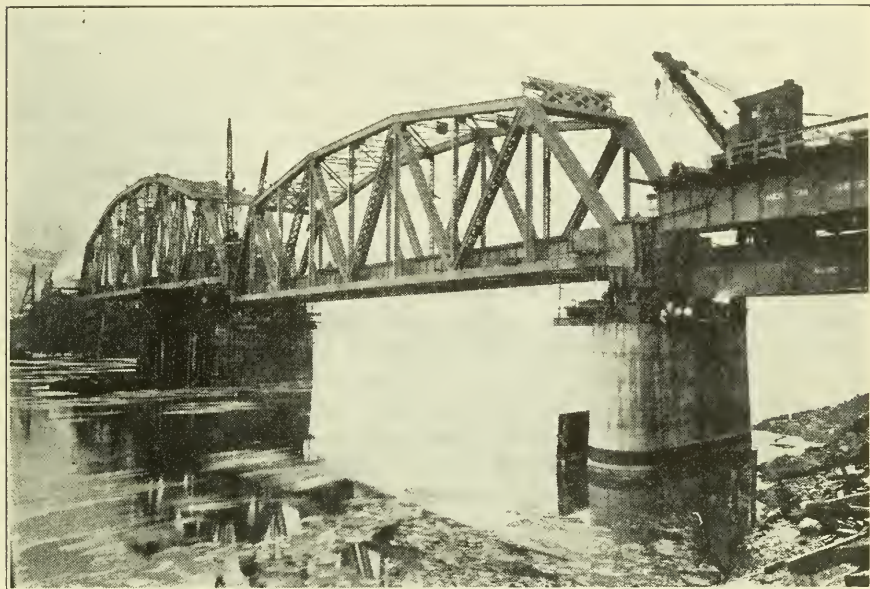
436 FT. 9-IN. SPAN AND ONE PLATE GIRDER SPAN IN FINAL POSITION.
